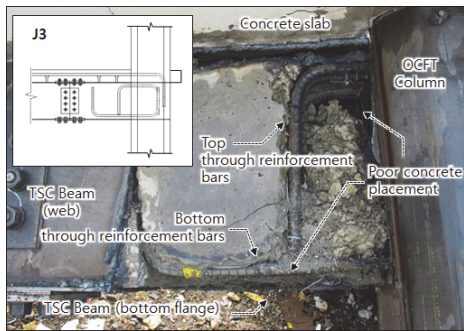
Poor concrete placement of TSC beam due to congested connection reinforcement bars
